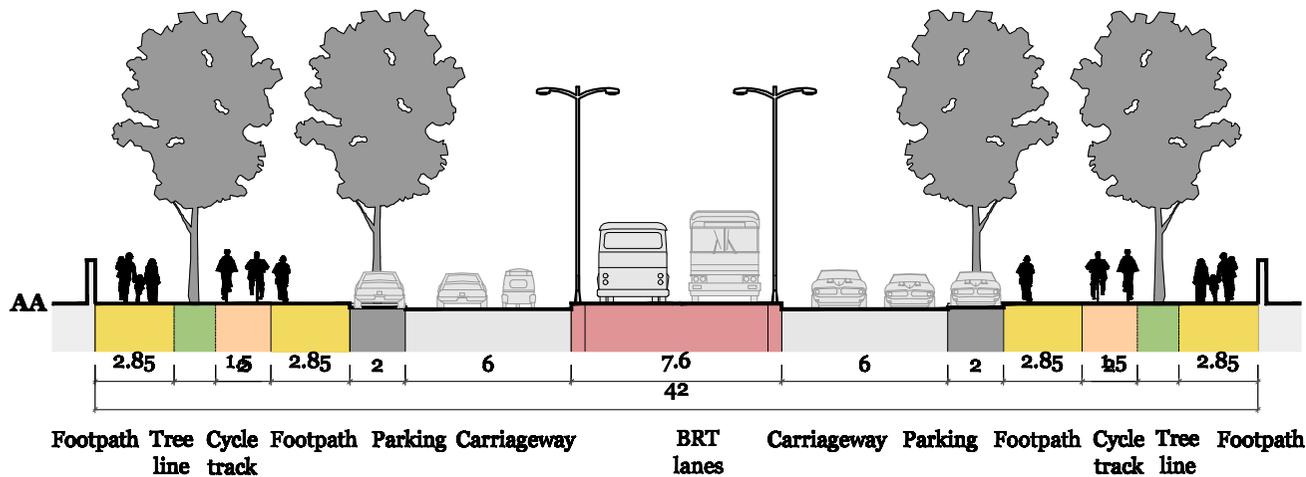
Section through mid-block for a typical BRT alignment for 42m ROW with single lane bus way and staggered station with overtaking lanes
